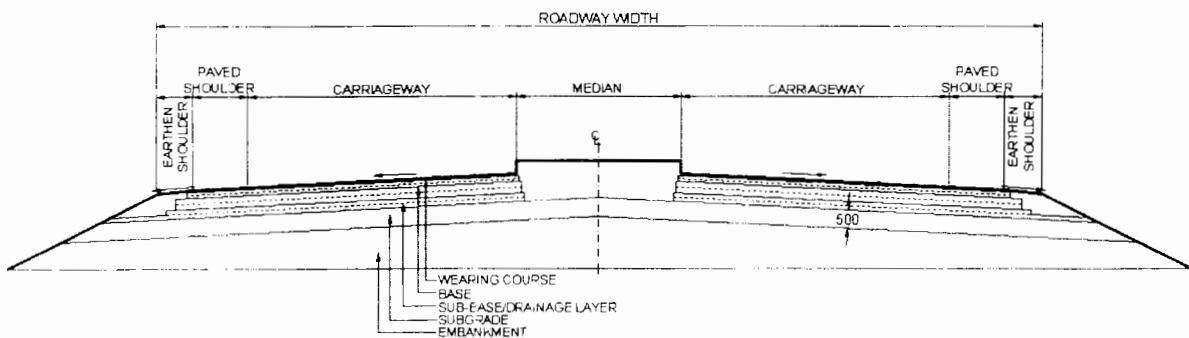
Terms Used in the Specifications to Describe Road Cross-Section Elements of a Dual Carriageway
